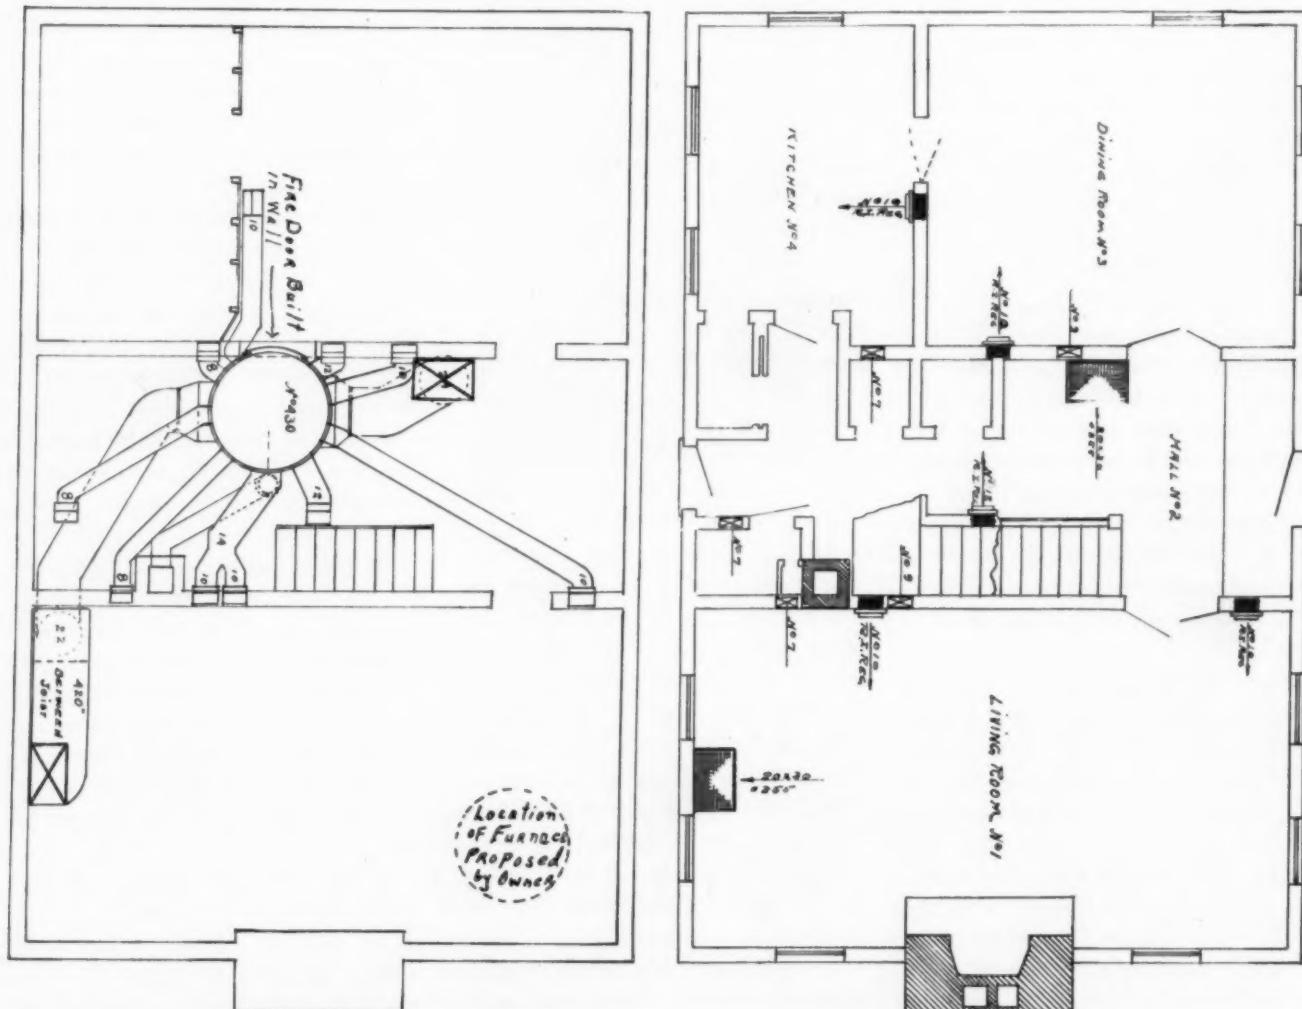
Basement and First Floor Plan of J. M. Allan Residence, Eureka, Illinois, Showing How Specifications Were Changed to Meet Needs of Heating Plans
